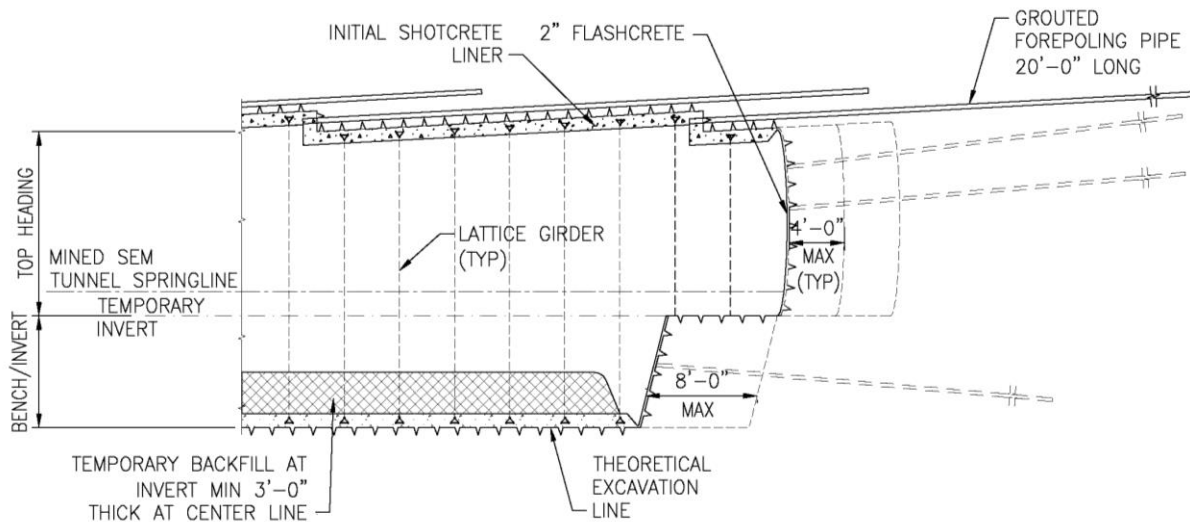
Typical SEM Longitudinal Section and Construction Sequence
